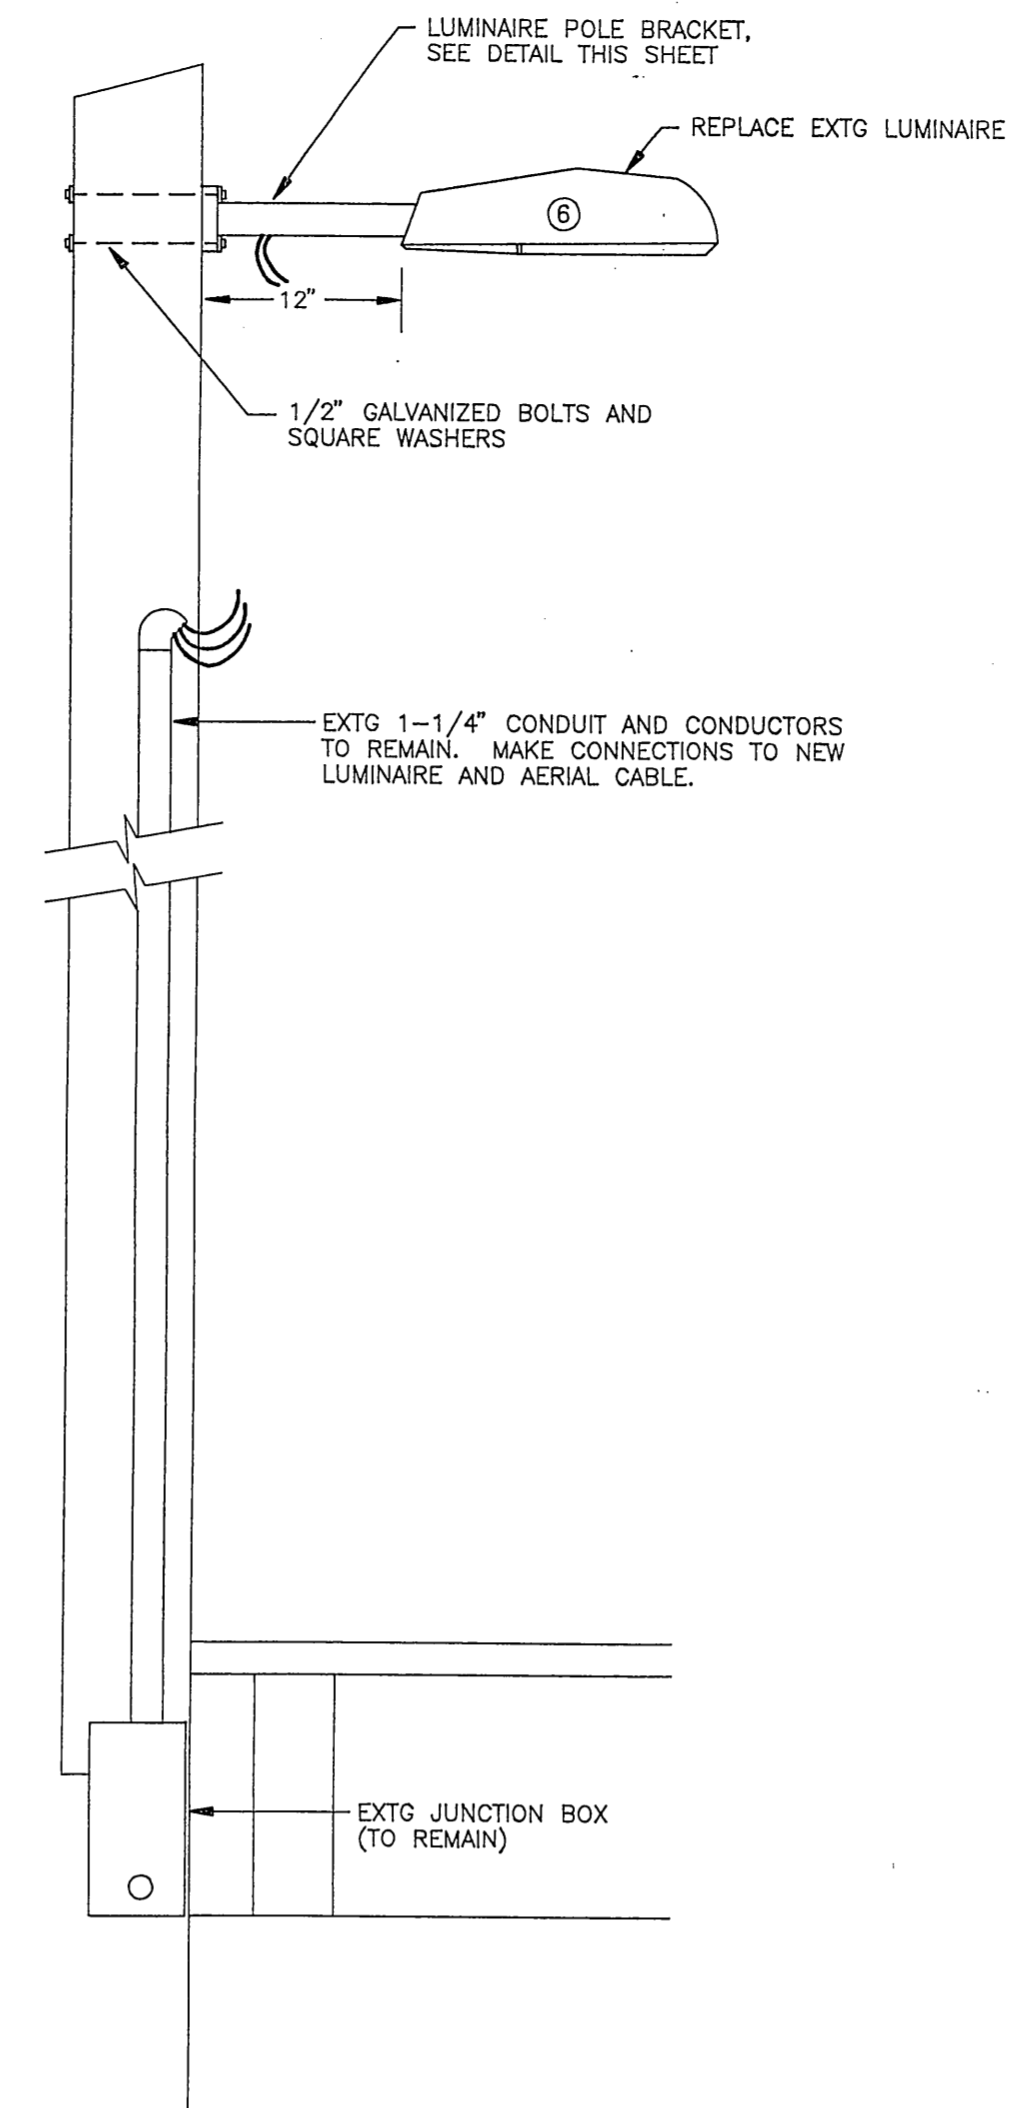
DETAIL - EXISTING PILING MOUNTED LUMINAIRE
